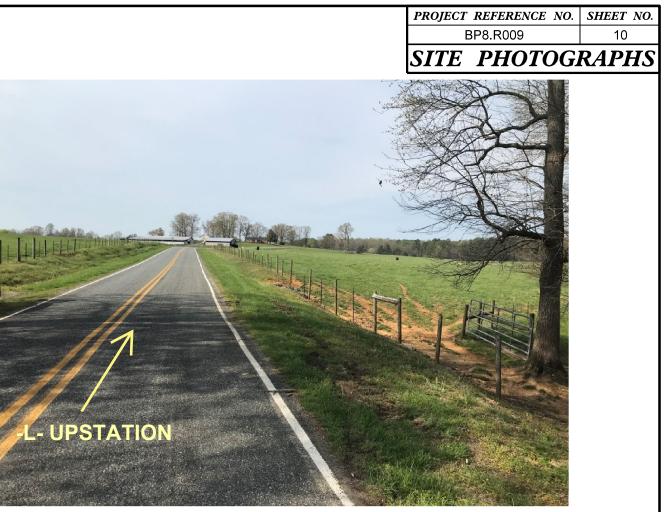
VIEW FACING BRIDGE 252 FROM -L- ALIGNMENT, LOOKING UPSTATION.
